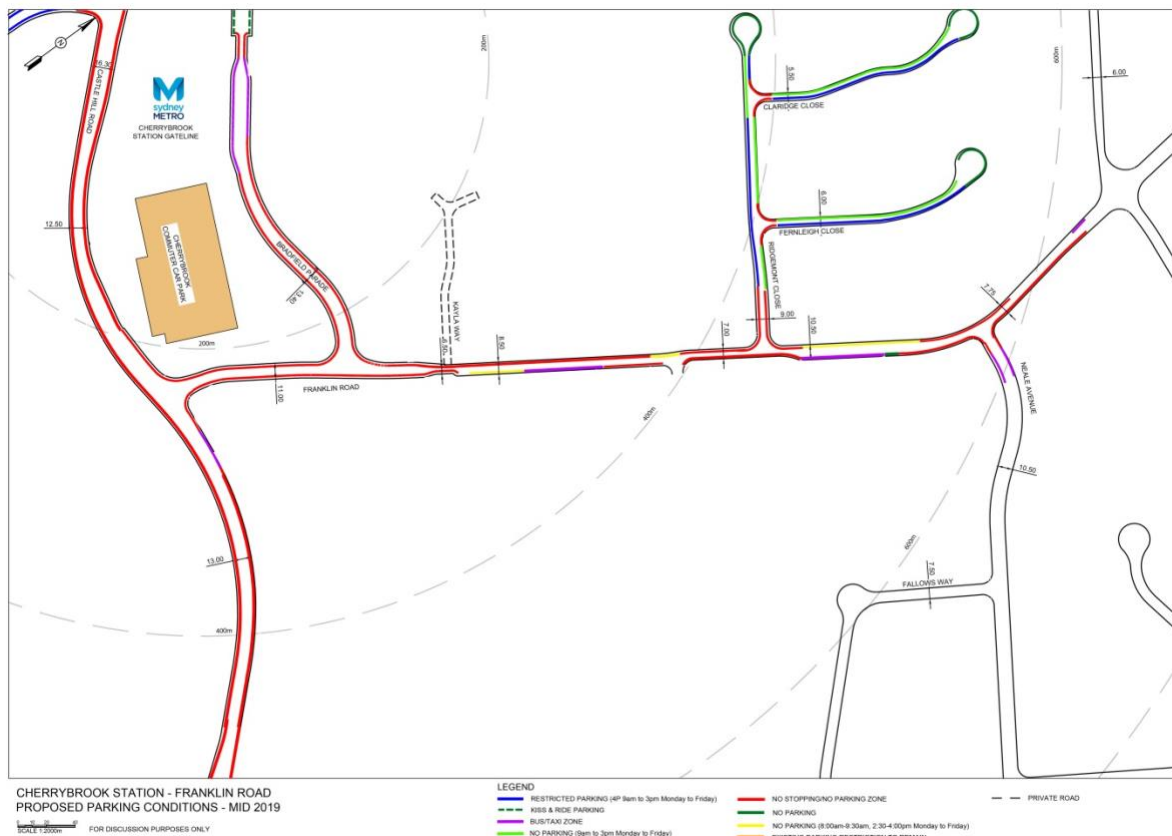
Proposed parking conditions mid-2019 – Franklin Road and linking streets
